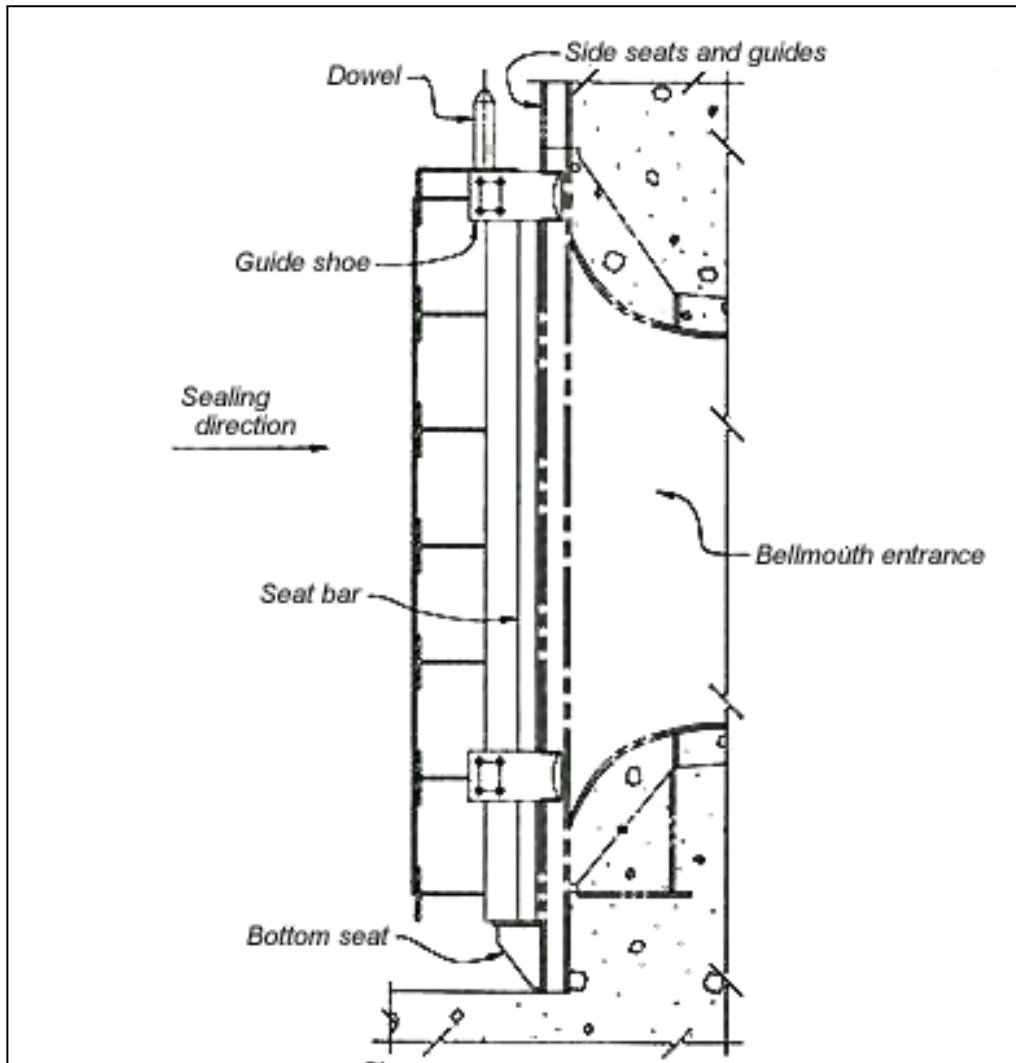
Bulkhead gate installed in outlet works entrance.
